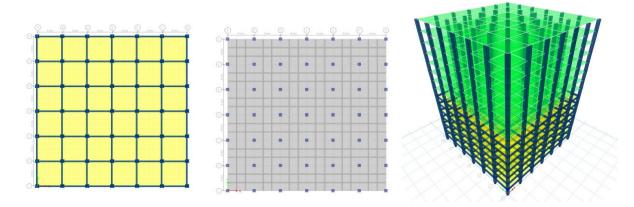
a. Plan view from Ground storey to 7th storey, b. Plan view from 8th storey to 15th storey and c. Elevation view of model CS+GS
